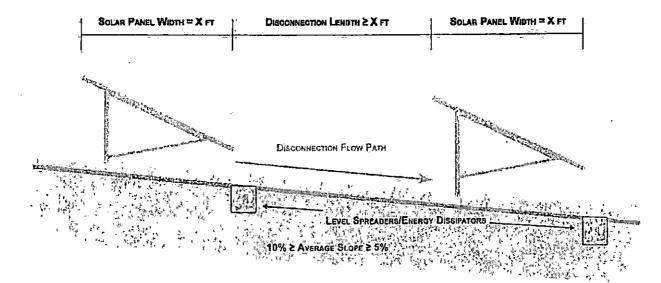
Typical Installation - Slope ≥ 5% but ≤ 10%
